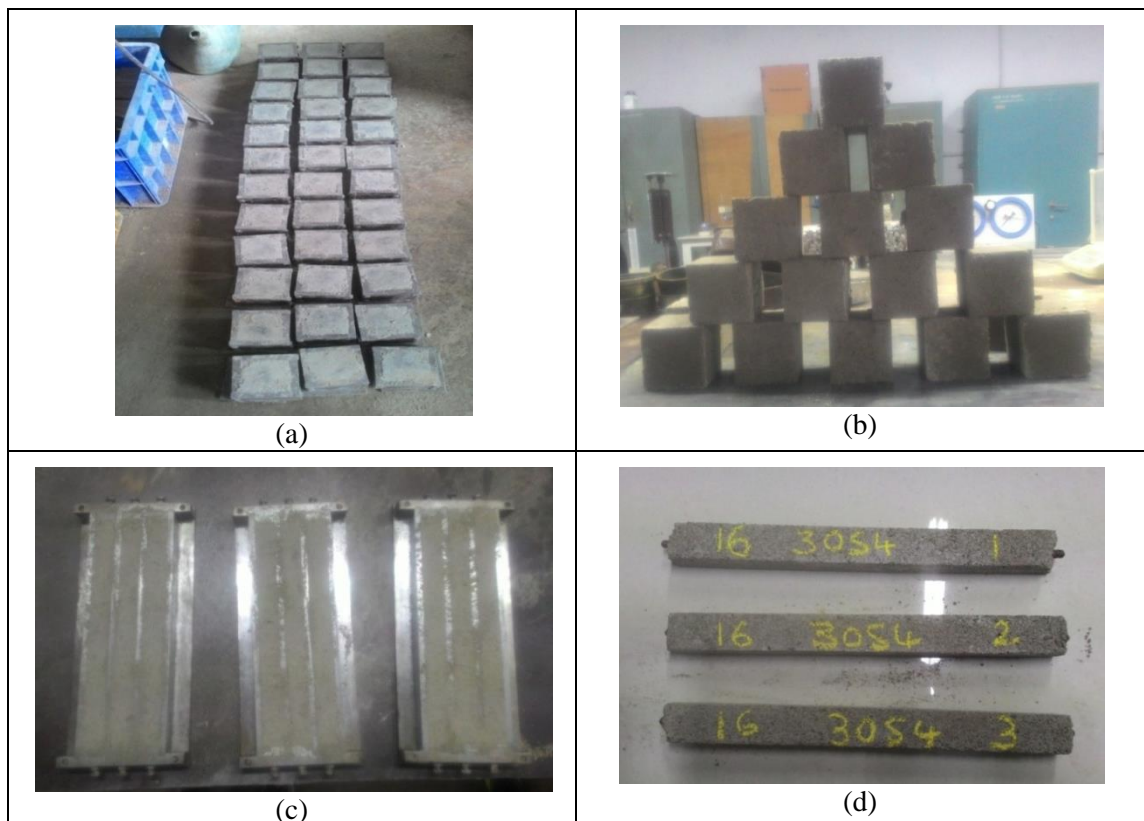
(a) Cast cube samples; (b) De-molded cube samples; (c) Cast prism specimens; (d) Prism samples after de-molding
